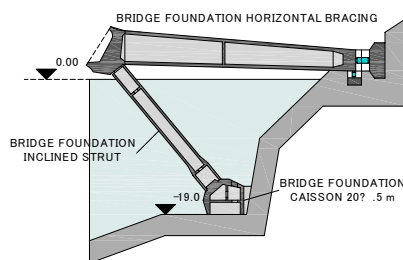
Foundation of Krk I arch at St. Marc Island shore
